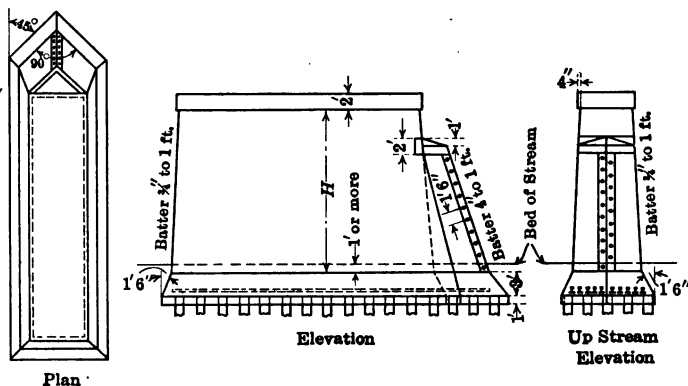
New York Central Railroad Standard Masonry Pier.
